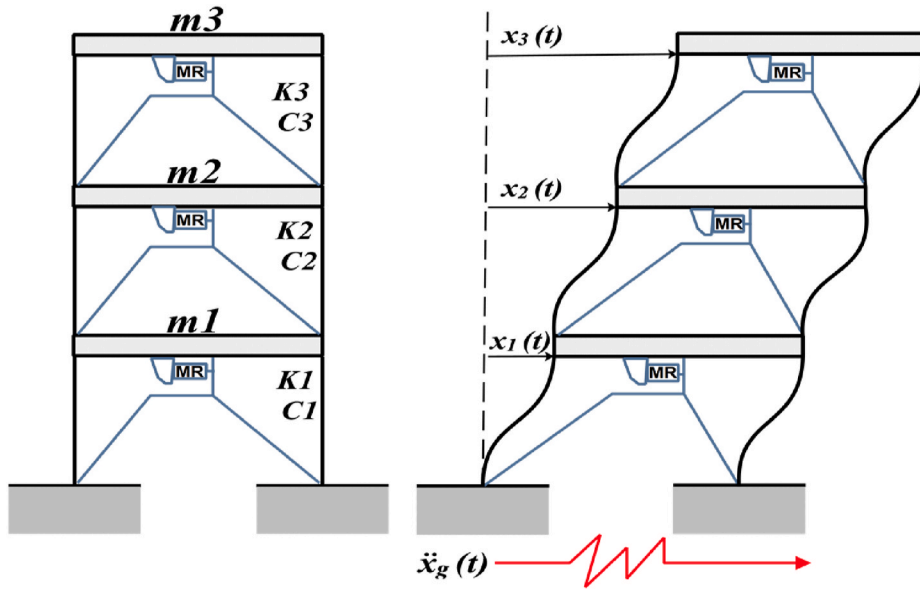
3-story building system equipped with MR damper under earthquake loading.
